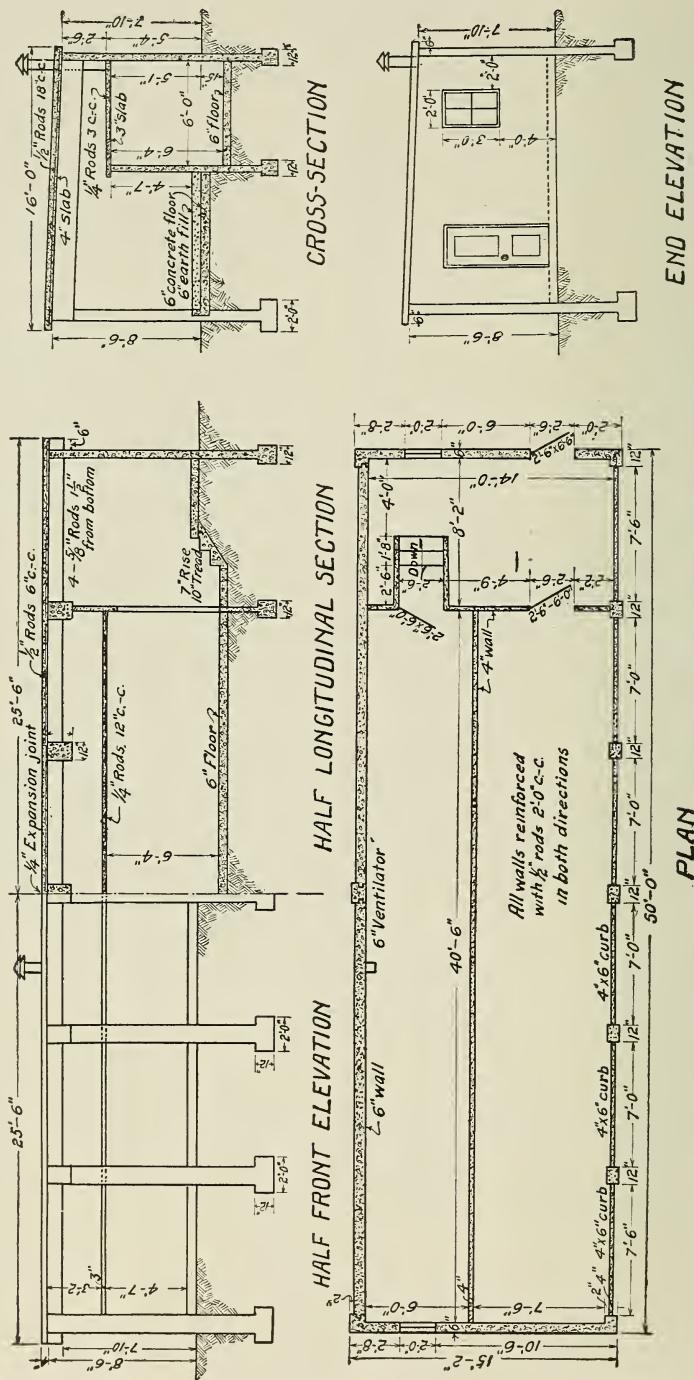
Reinforced Concrete Poultry House with Incubator Cellars, designed for I. S. Hamilton, West Bridgewater, Pennsylvania.
